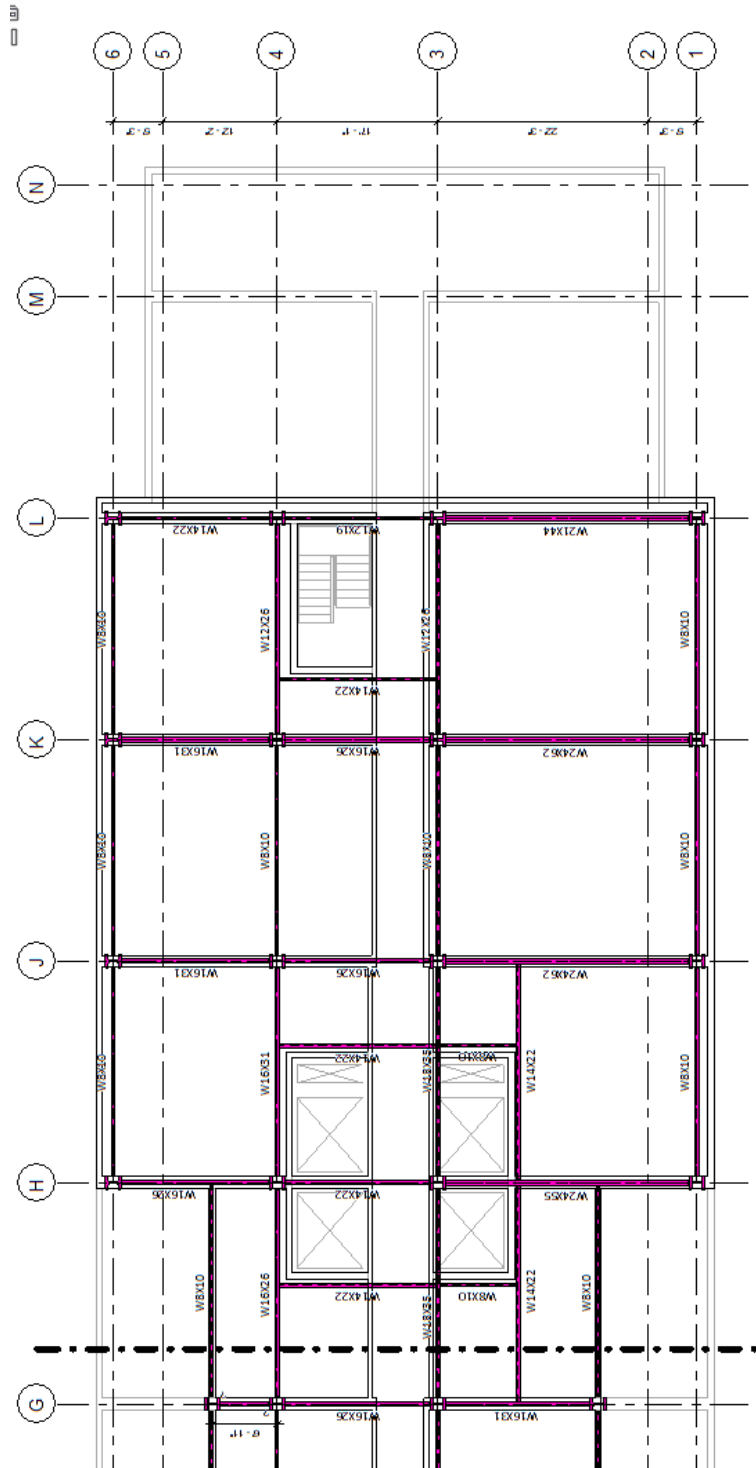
Typical Framing Plan for Levels 29 – 32 of Proposed Design
